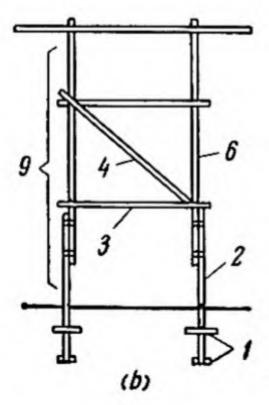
Parts of wood-pole supports for 35 to 100 kv over-head electric power lines:
